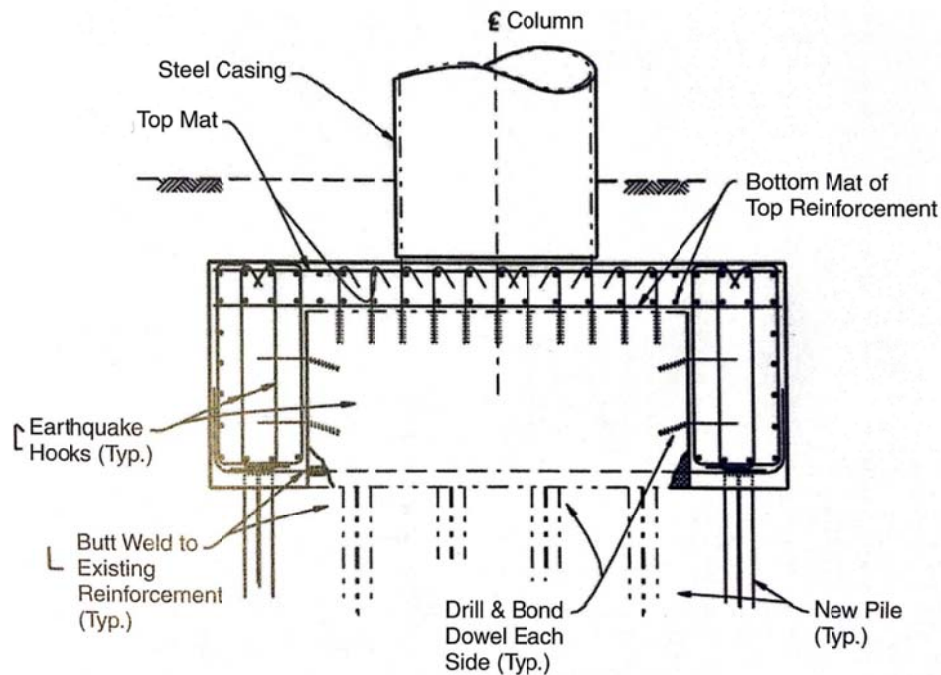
Pile supported footing retrofit (Source: Yashinsky and Karshinas, 2003)
